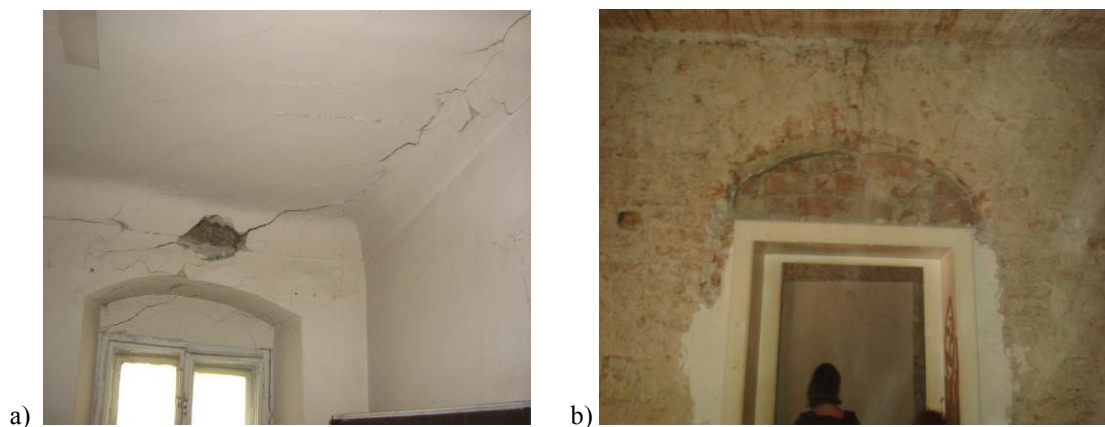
a) cracks around the windows and slab, b) cracks in the door
